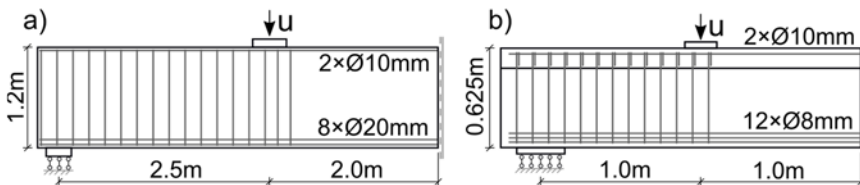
Reinforcement bar layouts of the modelled Rüsç & Rehm (1964) beams: a) specimen R102; b) specimen T31
